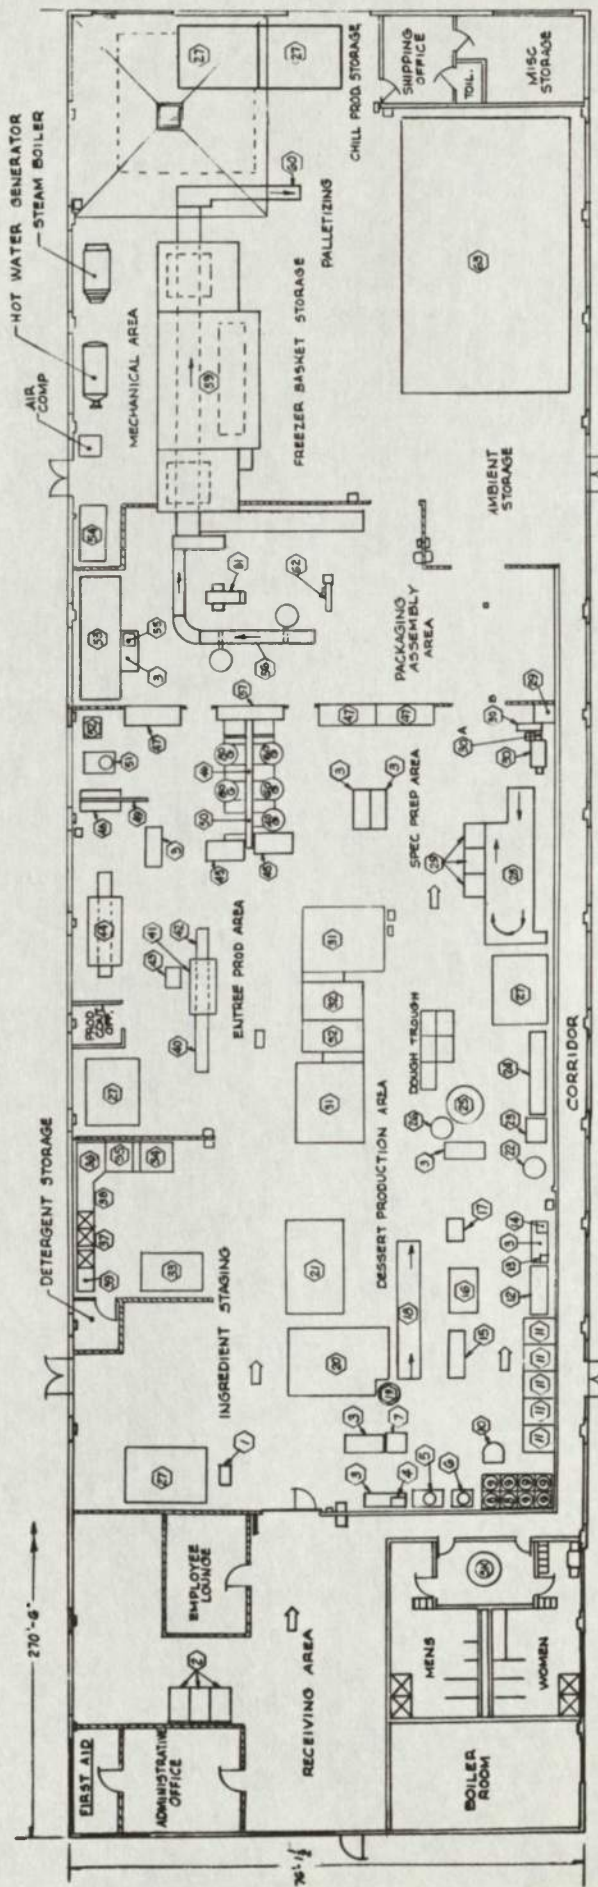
FLOOR PLAN OF CENTRAL FOOD PREPARATION FACILITY AT FT. LEE, VA
